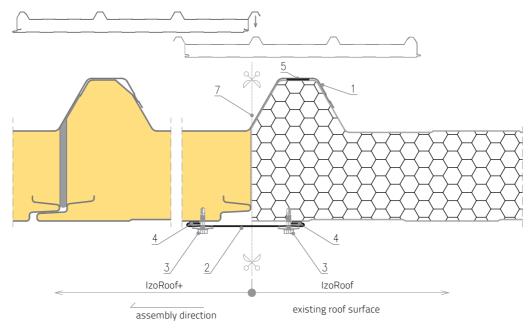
Joint of IzoRoof+ panel to IzoRoof panel installed in existing roof surface – dteailed view
